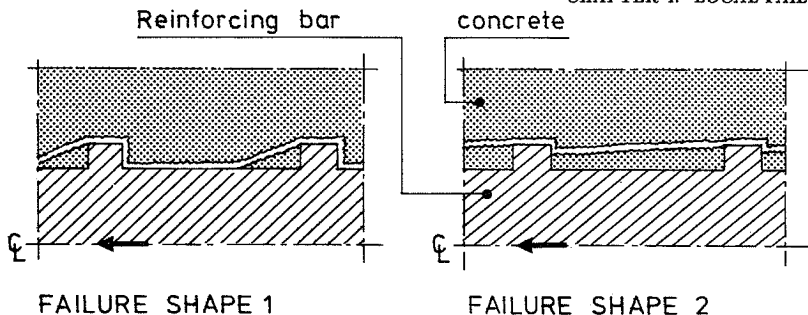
Possible failure shapes at an axisymmetric failure around a deformed bar.
